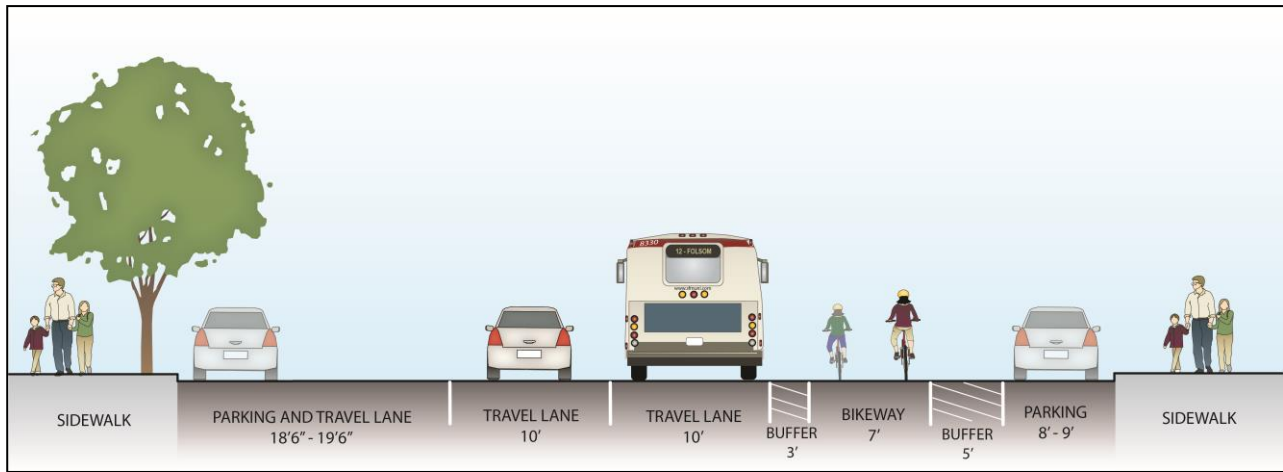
Proposed Pilot, Folsom Street from 11th Street to 4th Street
